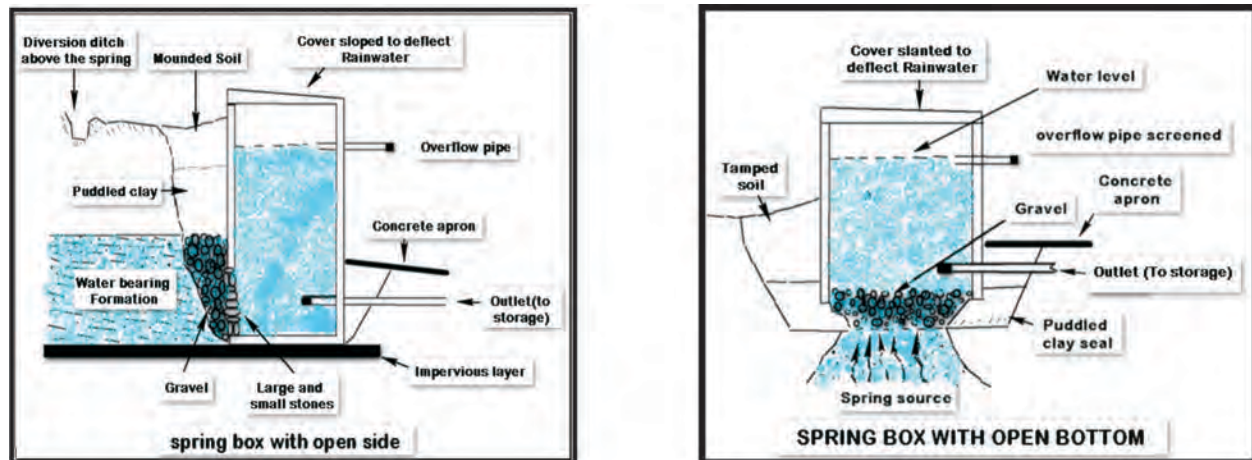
Spring box design (a) Open sided (b) Open bottom
